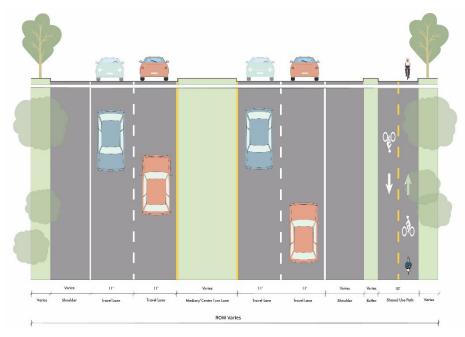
Where non-motorized facilities, such as side paths, are planned with the corridor, each development must construct such facilities.
